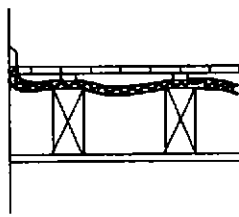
"Deemed to Satisfy" construction from Building Regs.
